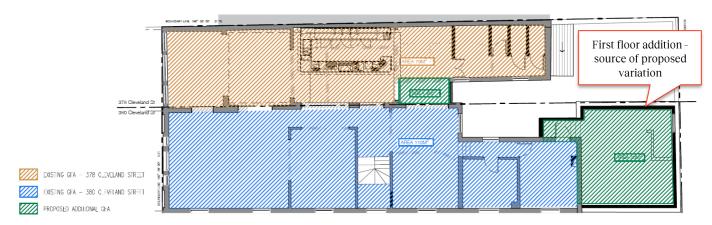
Existing and proposed gross floor area plan (first floor) (Source: Richards Stanisich, Drawing No. DA-0011)
